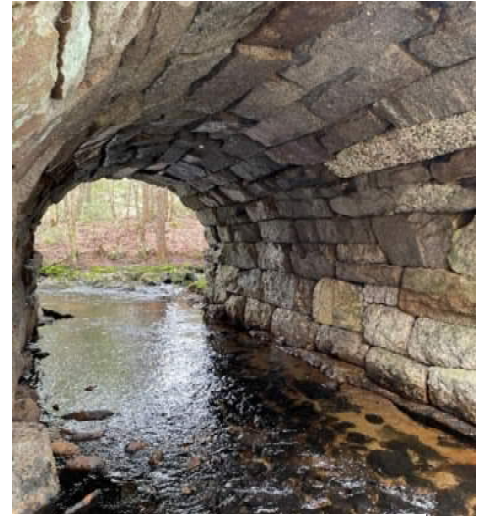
Pigeon Brook Bridge – Stone Arch Culvert Barrel
